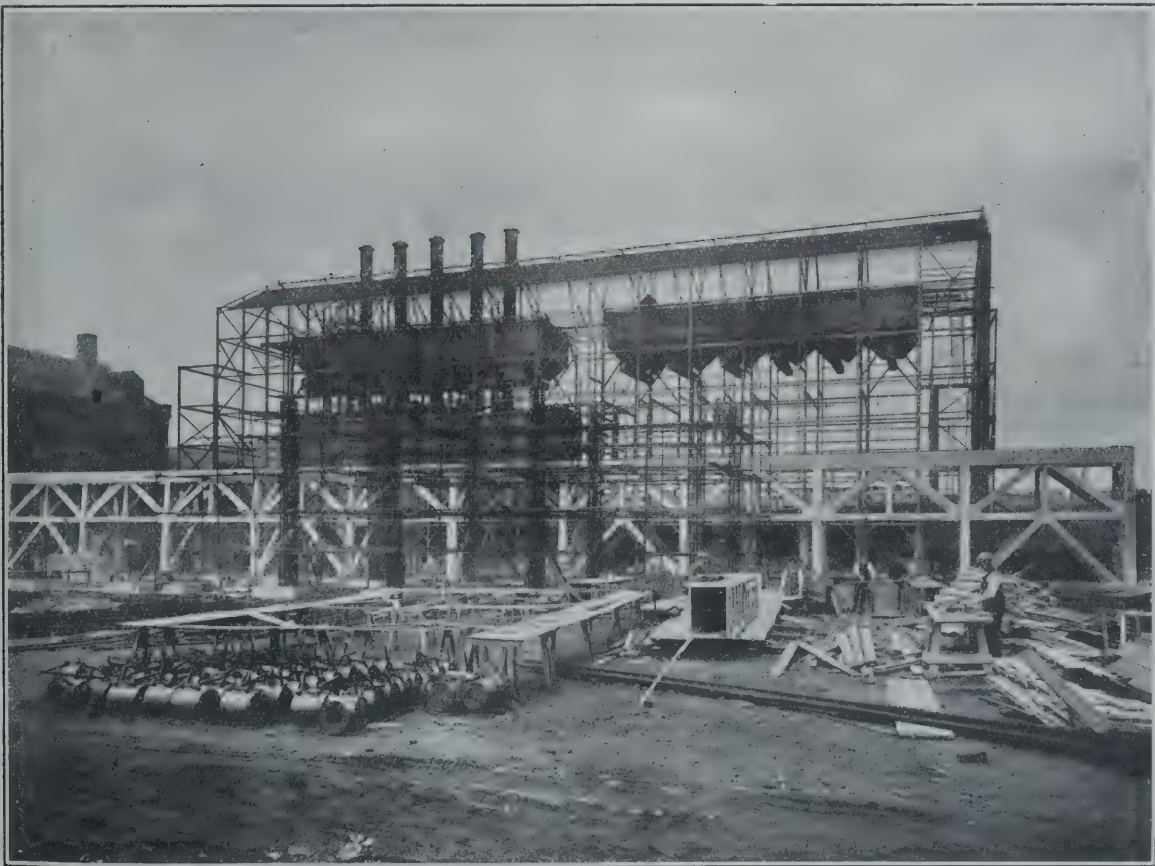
NEW GAS WORKS FOR BLACKBURN CORPORATION AT GREENBANK. Reinforced Concrete Crane Gantry, Retort House Foundations, and Coke Hoppers built on Simplex Concrete Piles for West's Gas Improvement Company, Ltd., Manchester. Designed by Mr. BURNARD GEEN, M.I.C.E.
